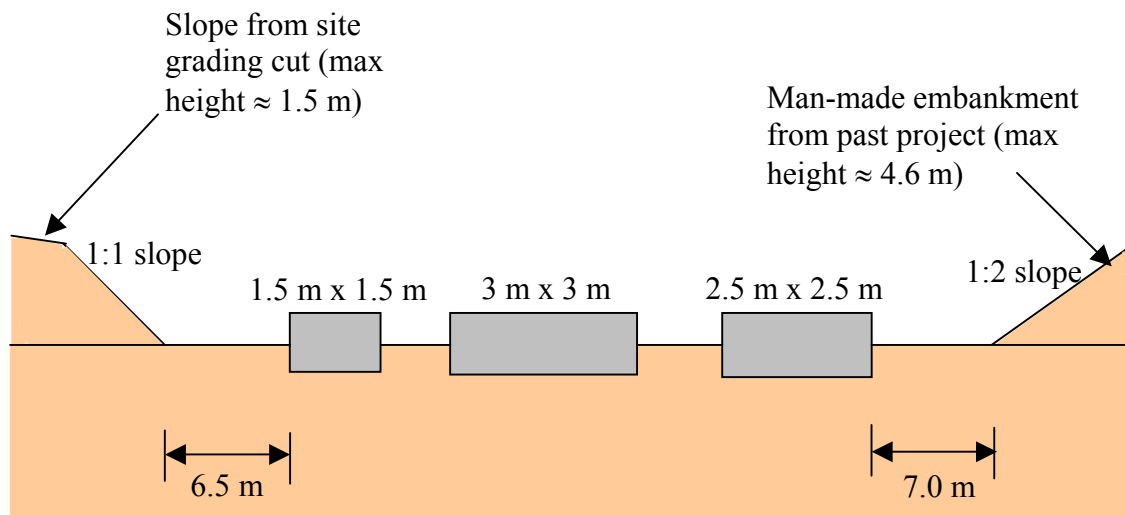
a): Cross-section A-A (see Figure 5.1b for location of cross-section)
